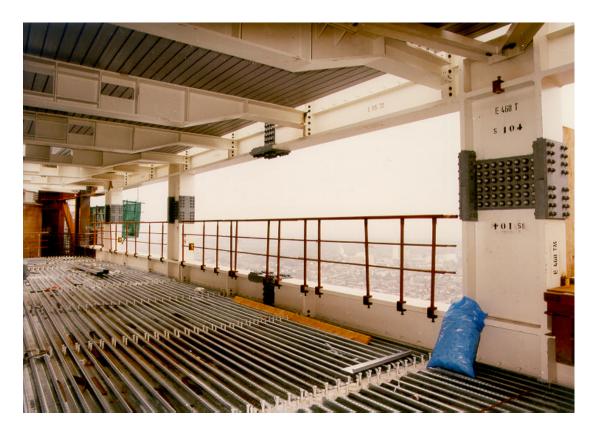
Building construction with heavy plates, Commerzbank-Tower (structure of piles)
